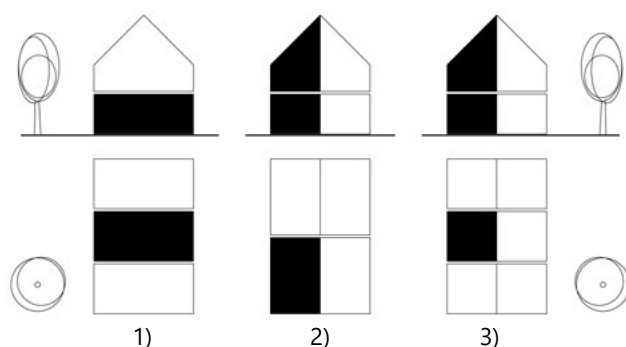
Type of buildings: 1) over-and-under flat type buildings, 2) four-family residential buildings, 3) back-to-back residential buildings; Source: author's graphic
